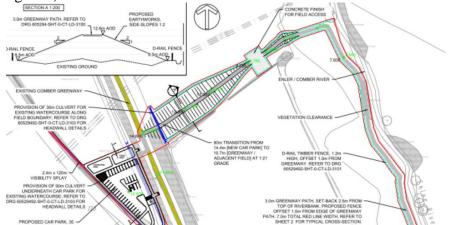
Proposed embankment between proposed car park and Enler River (Drawing 28C).
